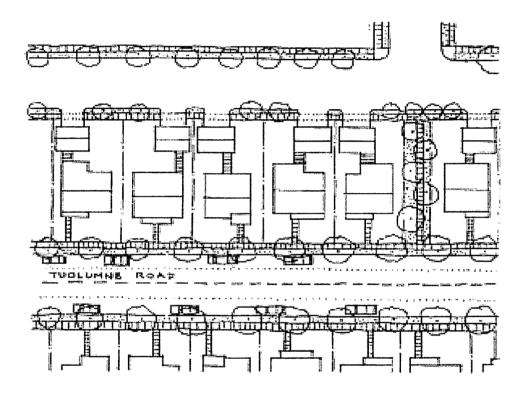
Illustrative Plan. Tuolumne Road Residential Neighborhood.
